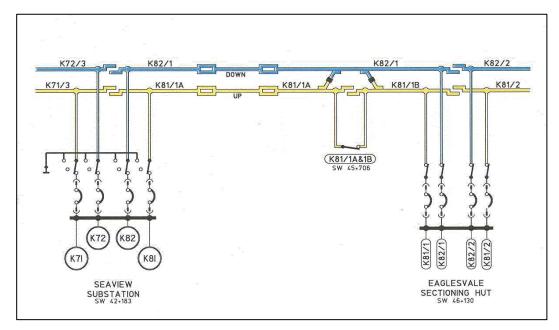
Sectioning diagram for a two track arrangement between a substation and a sectioning hut
